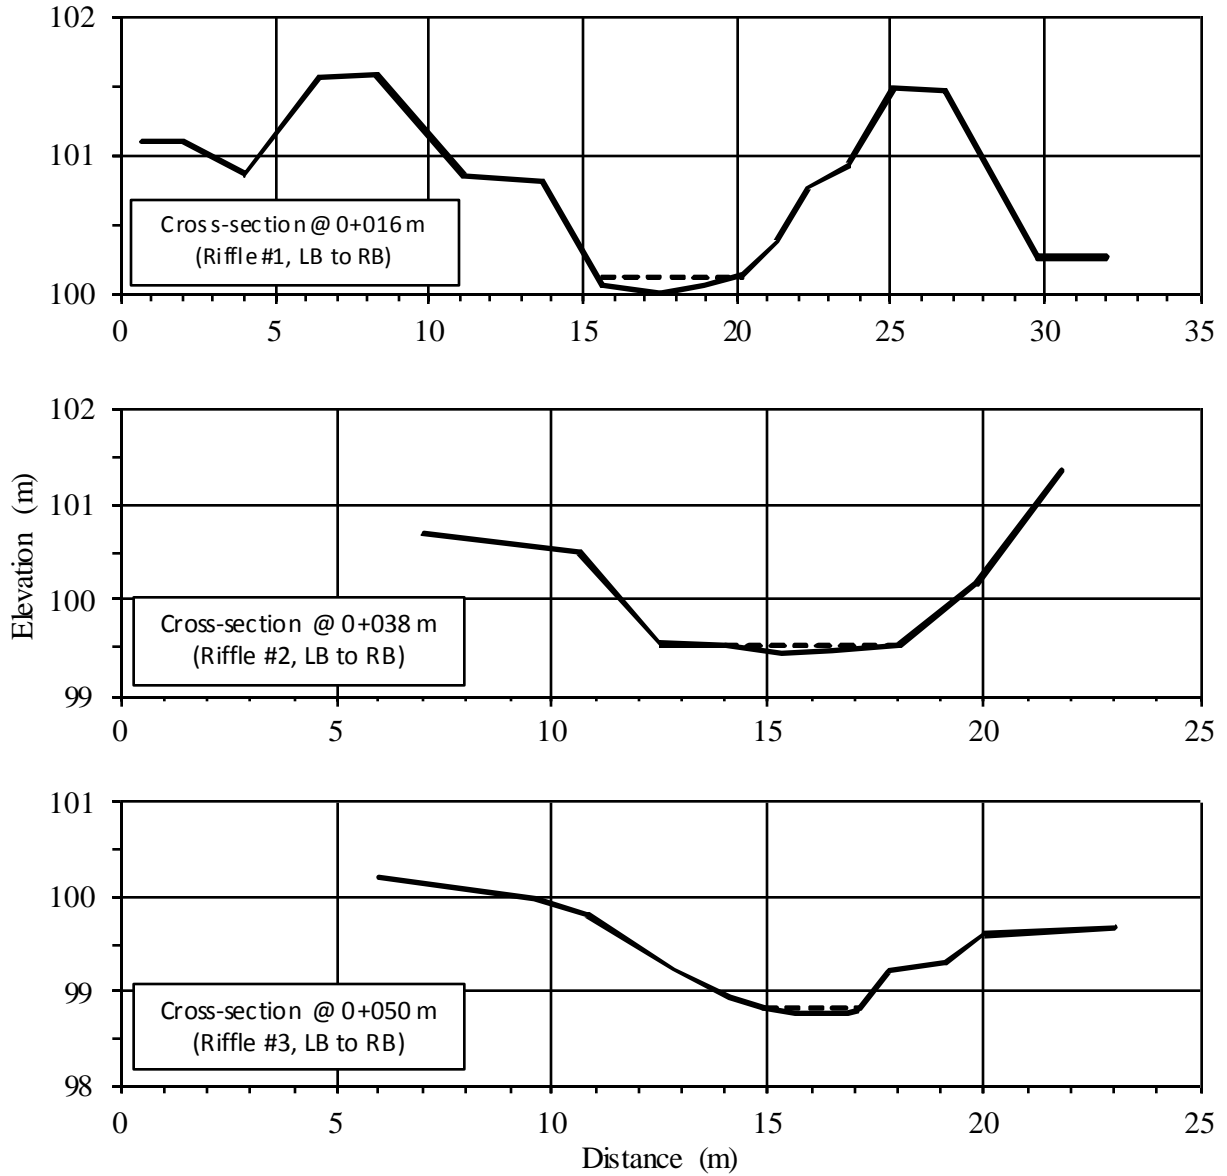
Cross sections at the riffles of the restored site on Johnny David Creek at Highway 16, 20 July 2017.
